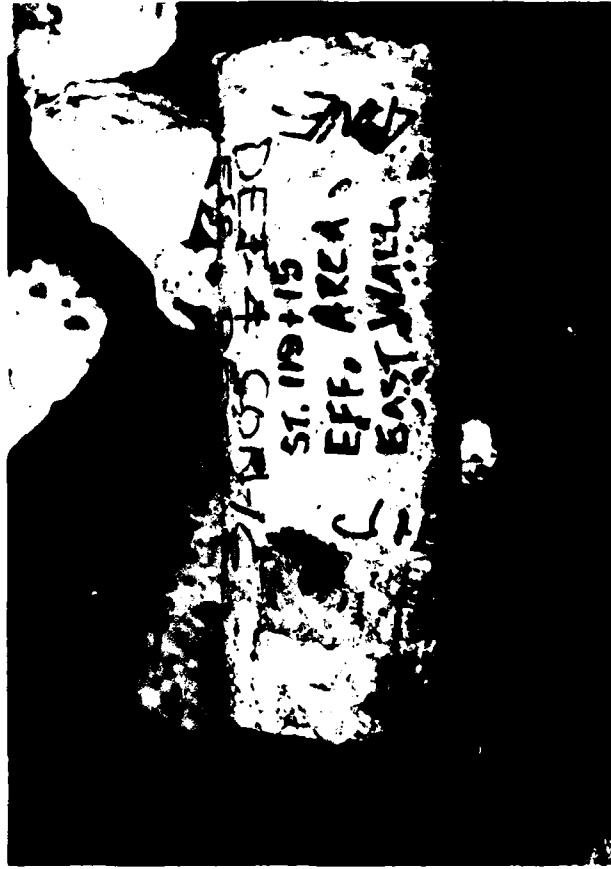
Six-in. diameter culvert wall core DEE-4 (Cell-16); it was drilled over the cold joint where it showed efflorescence and a sediment inclusion; Sta 119+15 nondistressed area
